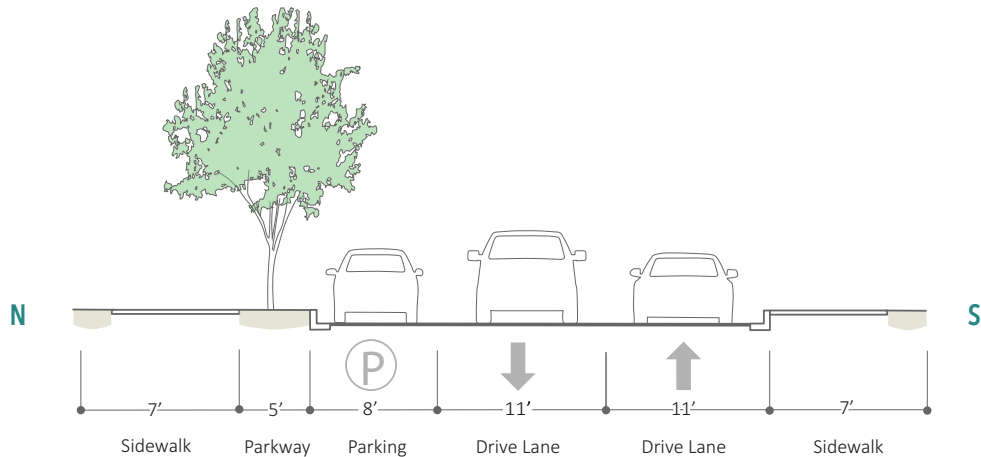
SECTION K - NEW (PARKSIDE) RESIDENTIAL STREET
